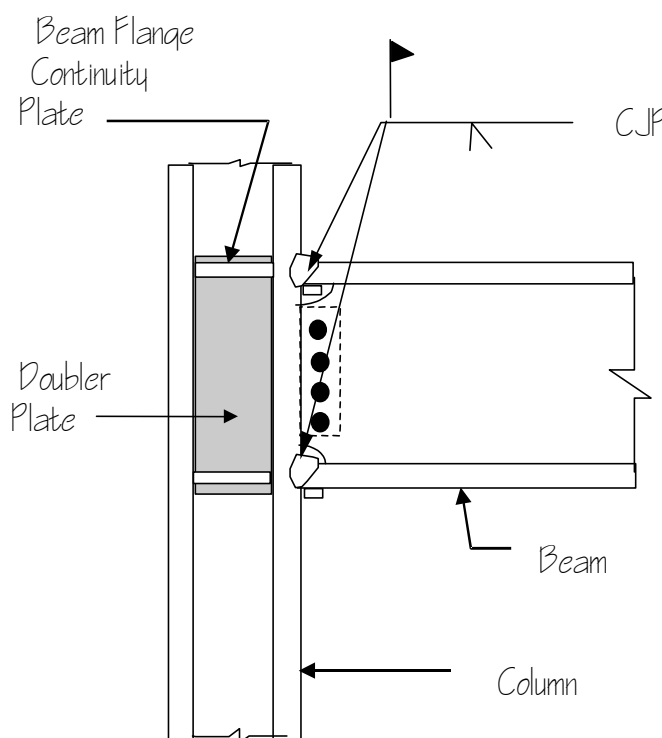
Welded Unreinforced Fully Restrained Connection (pre-1994)
